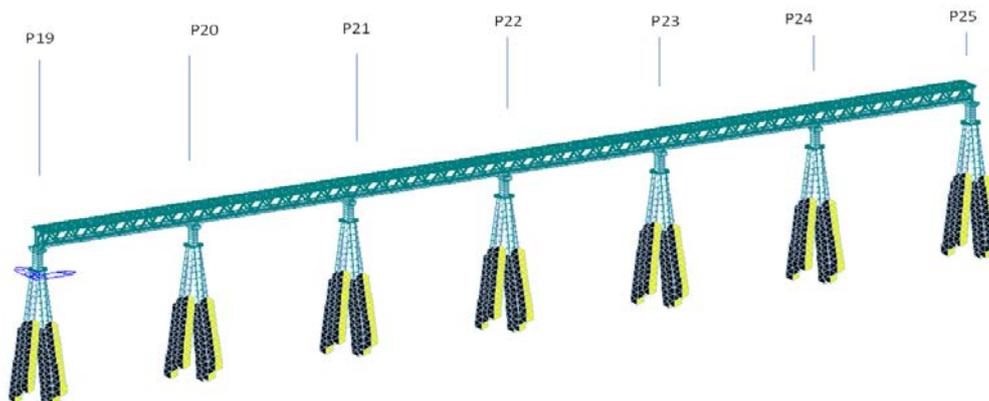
3D Finite element model of the bridge module with soil-structure interaction
